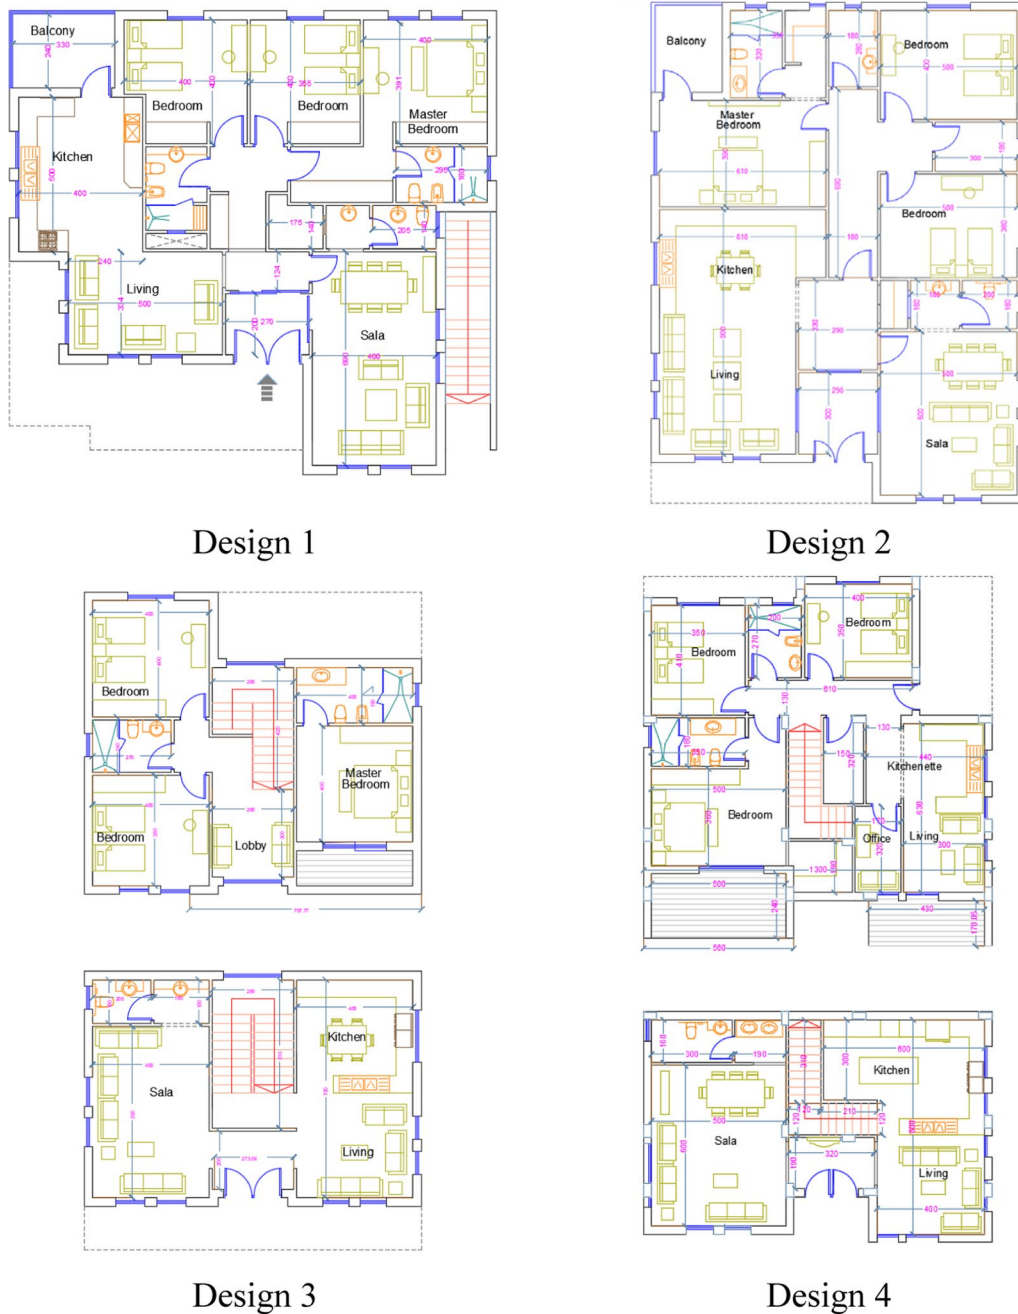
Architectural plans of designed households 1–4 (from left to right)
